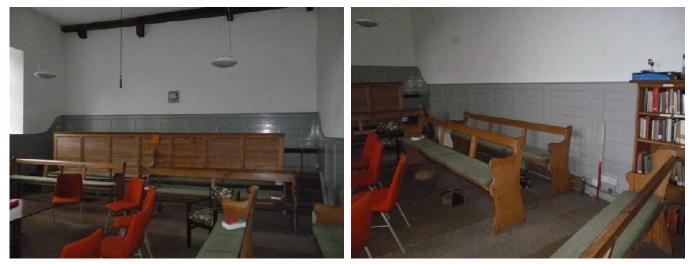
(left): The north-west elevation of Ground Floor Room 1 Plate 32 (right): The north-east elevation of Ground Floor Room 1
